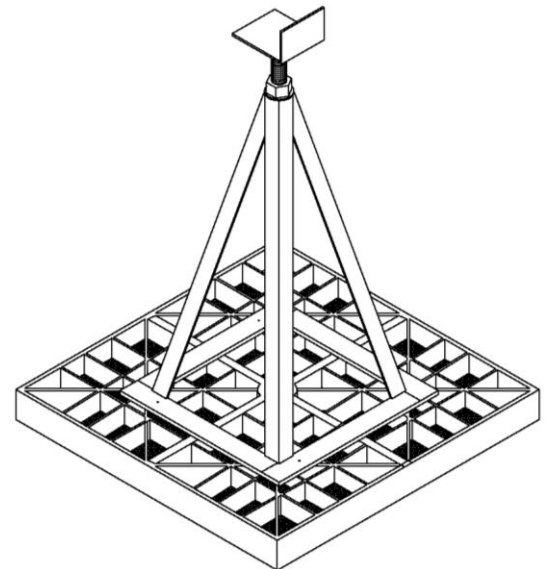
(d) Typical Fiber Reinforced Concrete Slab Footings
